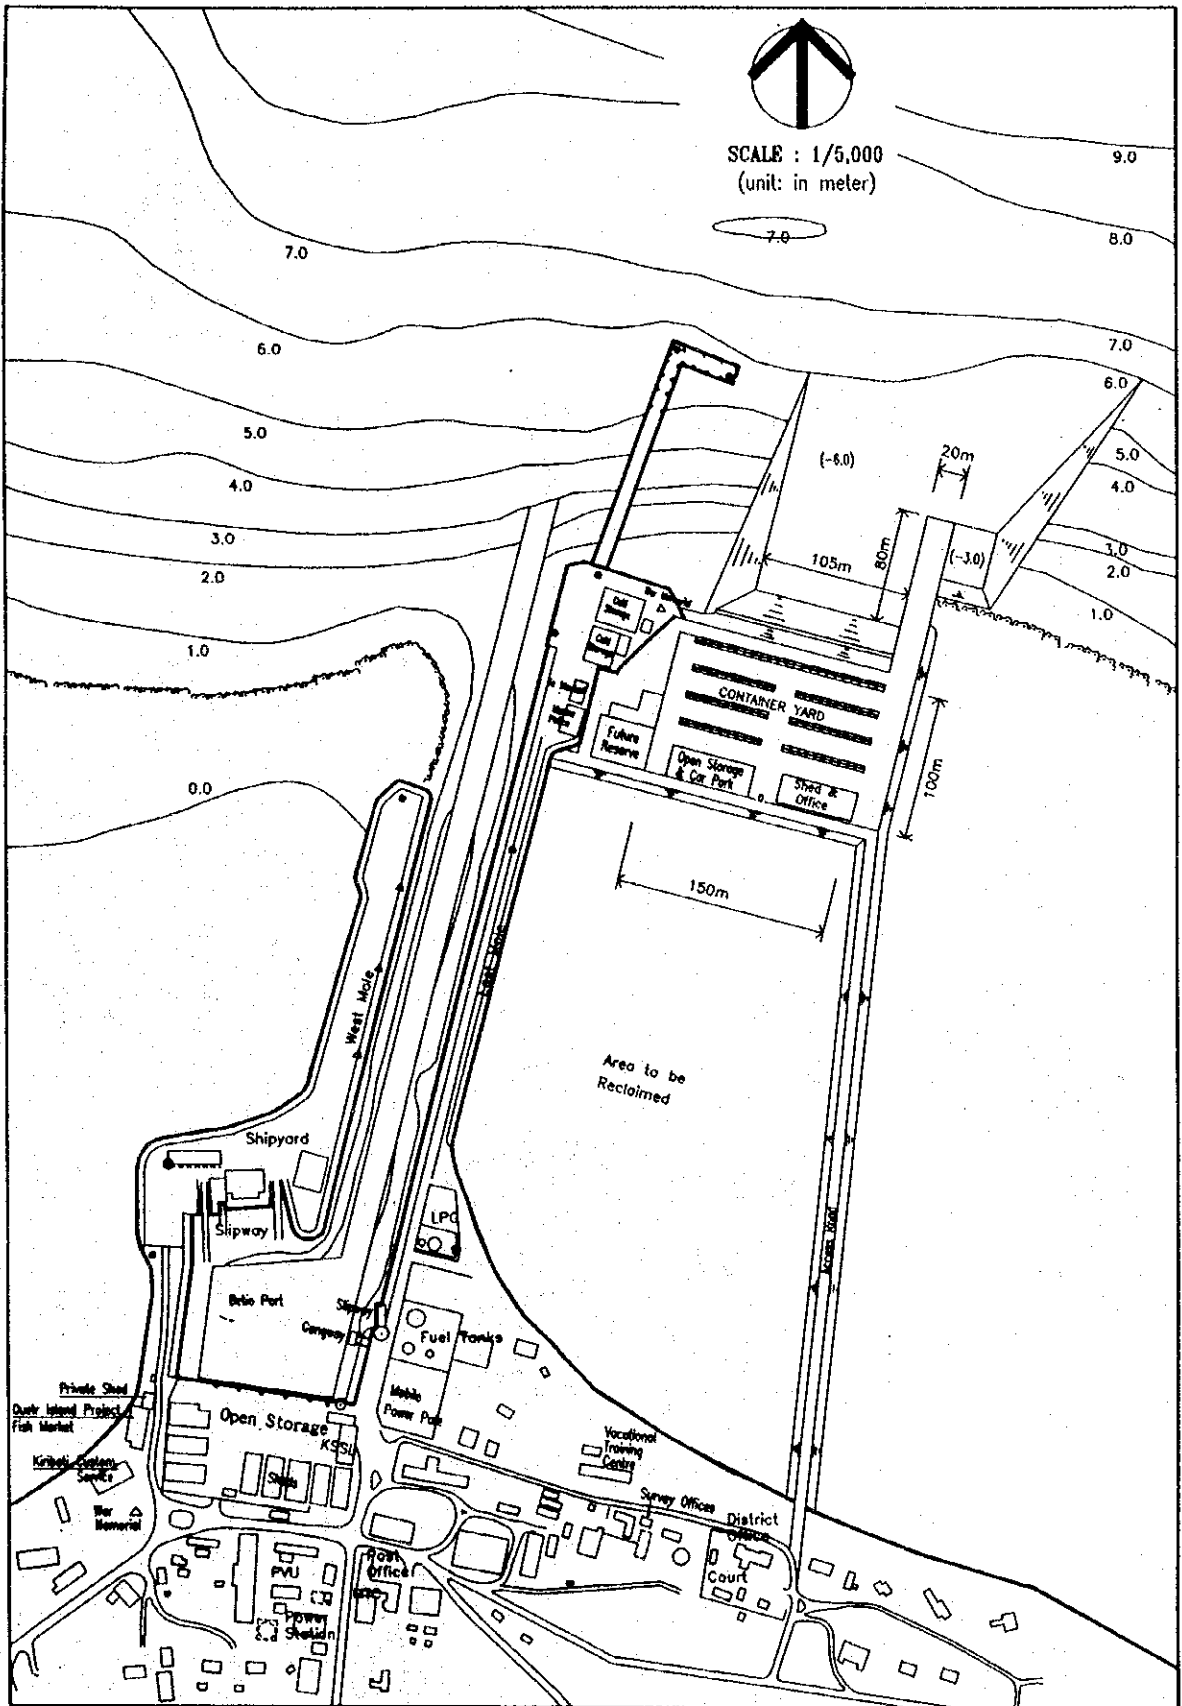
Proposed Layout Plan of Port Facilities
